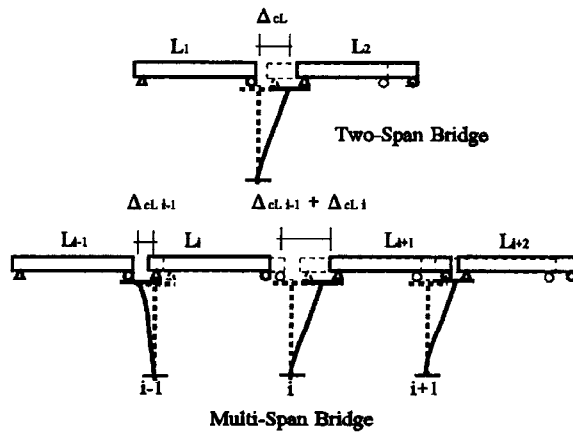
Maximum expansion joint opening before the failure of columns
